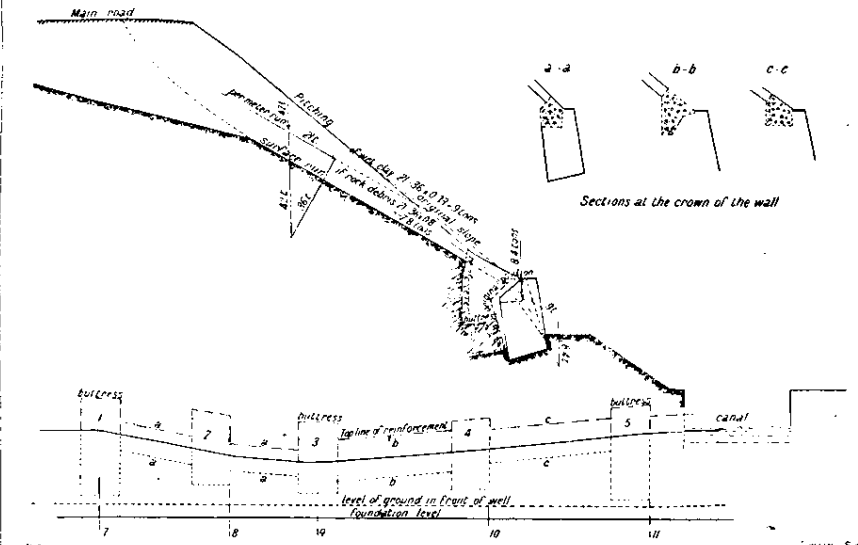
STRENGTHENING A FAILING DRY STONE WALL
